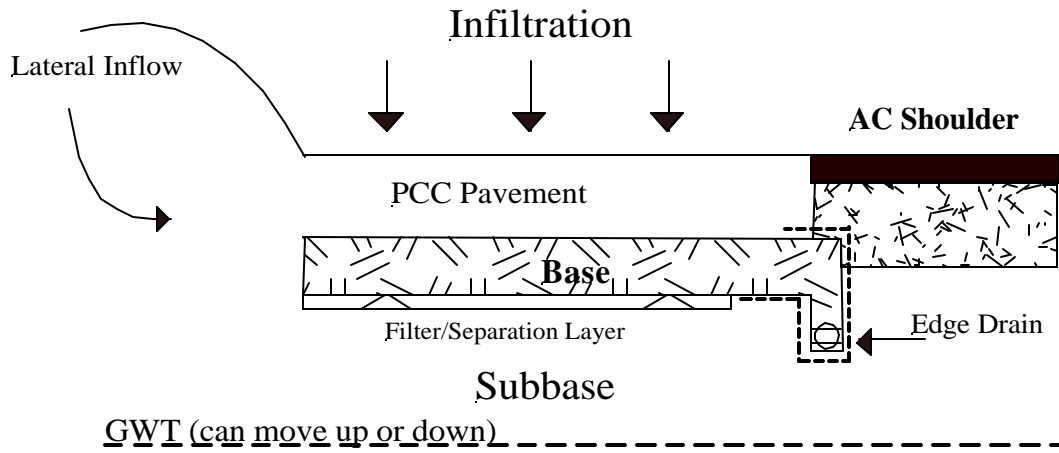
Typical pavement cross-section showing drainage system and possible sources of water.
